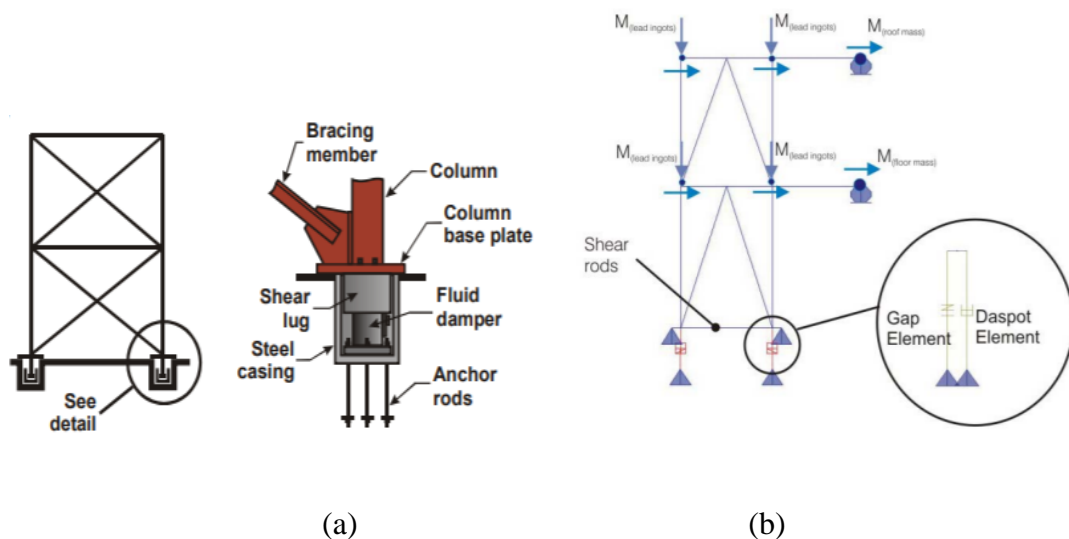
(a) Viscously damped controlled rocking steel braced frame system (b) Numerical model (Tremblay, et al. 2008)
